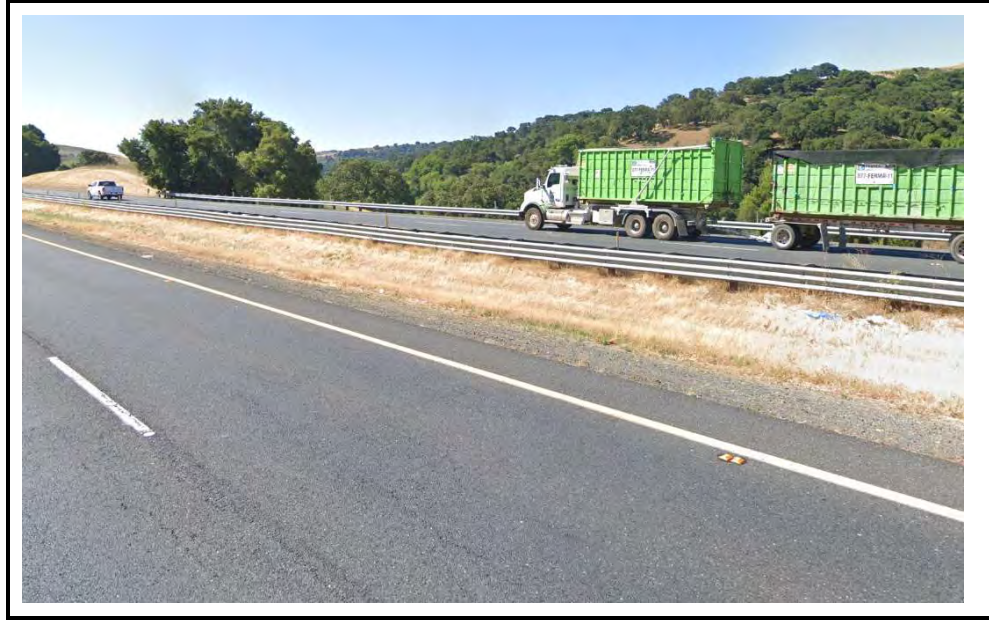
PHOTO C: VEGATED STRIP AND SWALE – DOWNSTREAM (SOUTHEAST)
